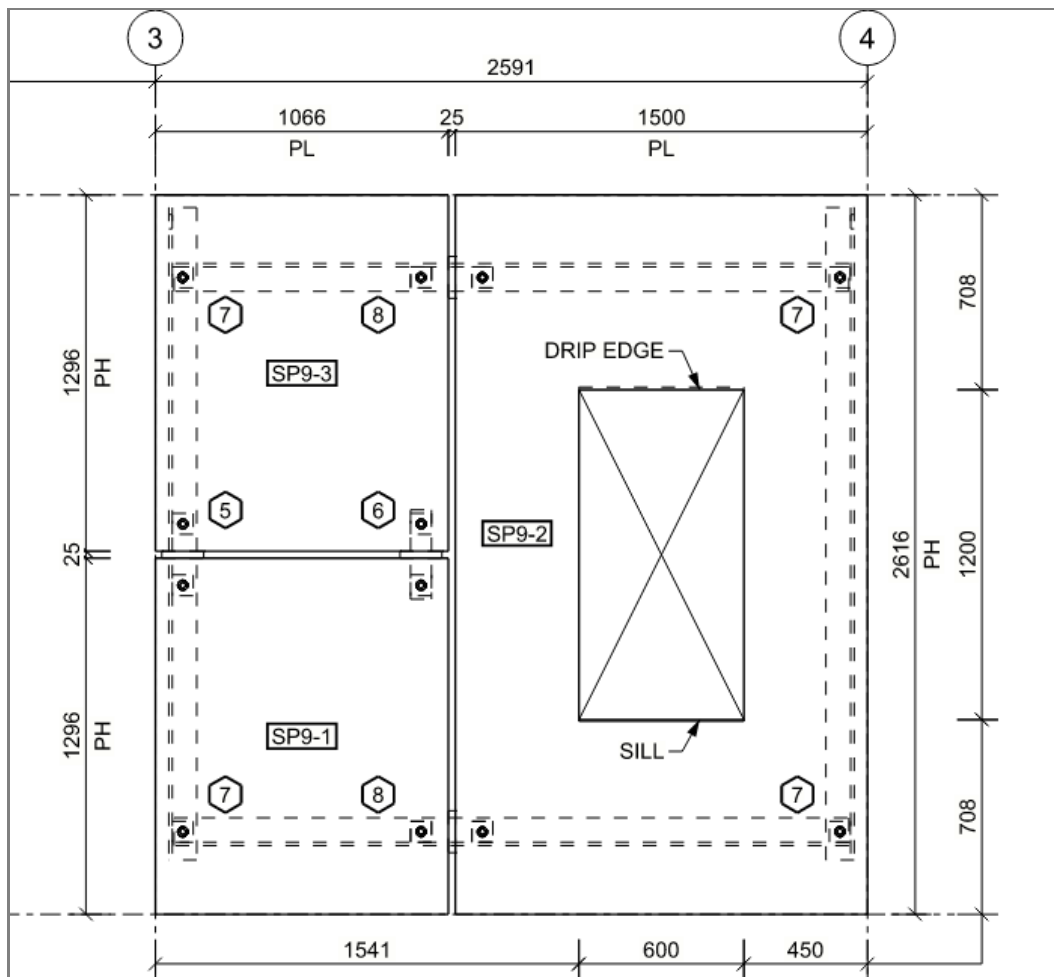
Elevation showing panel layout and dimensions for test wall specimens . The panel layout and dimensions were the same for both test walls.
